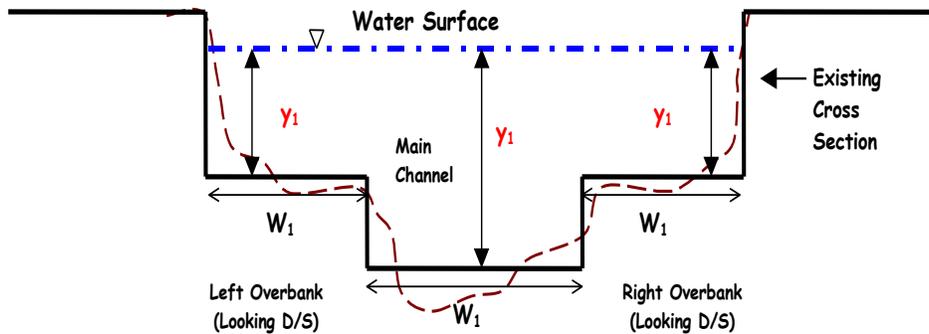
Definition Sketch for ABSCOUR Approach Section (Looking Downstream)
